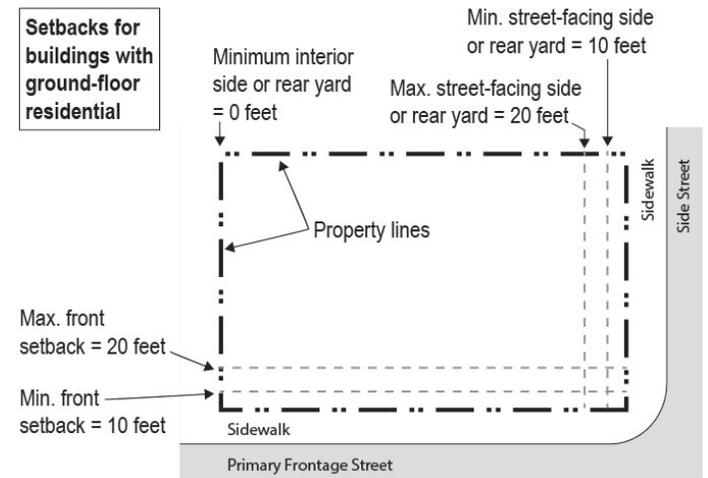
RC-DT Setbacks - with ground-floor residential
